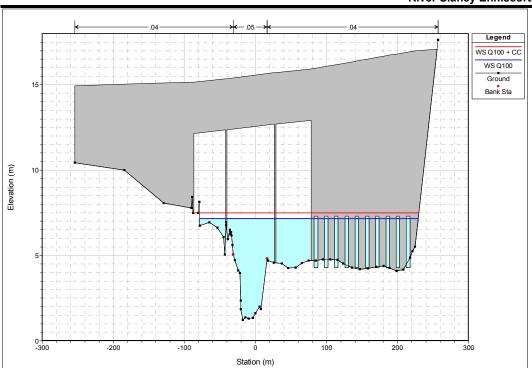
Option 4 - 3 Span Structure with embankment culverts (10 No. 4.8m wide by 3m high)
